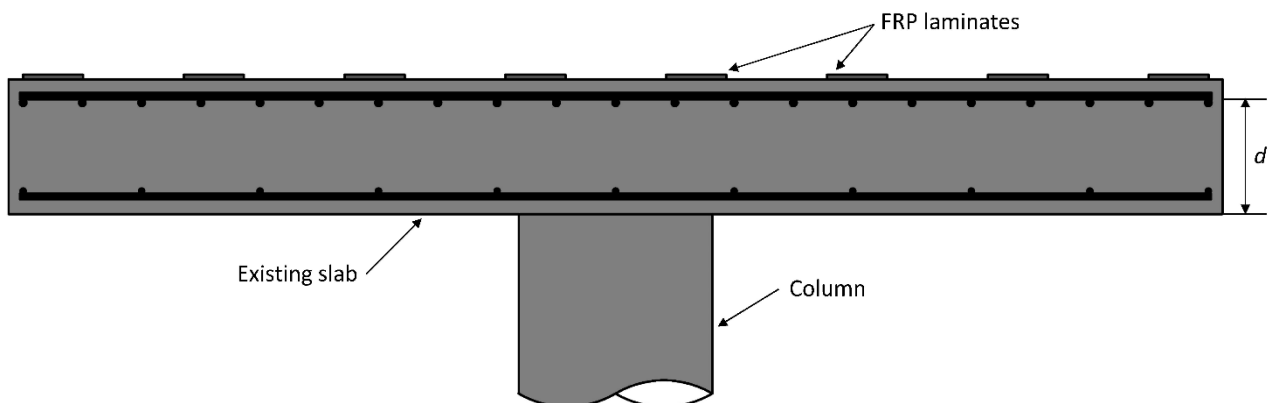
Cross-section of a strengthened slab with FRP strips (adapted from Faria et al. [24])
